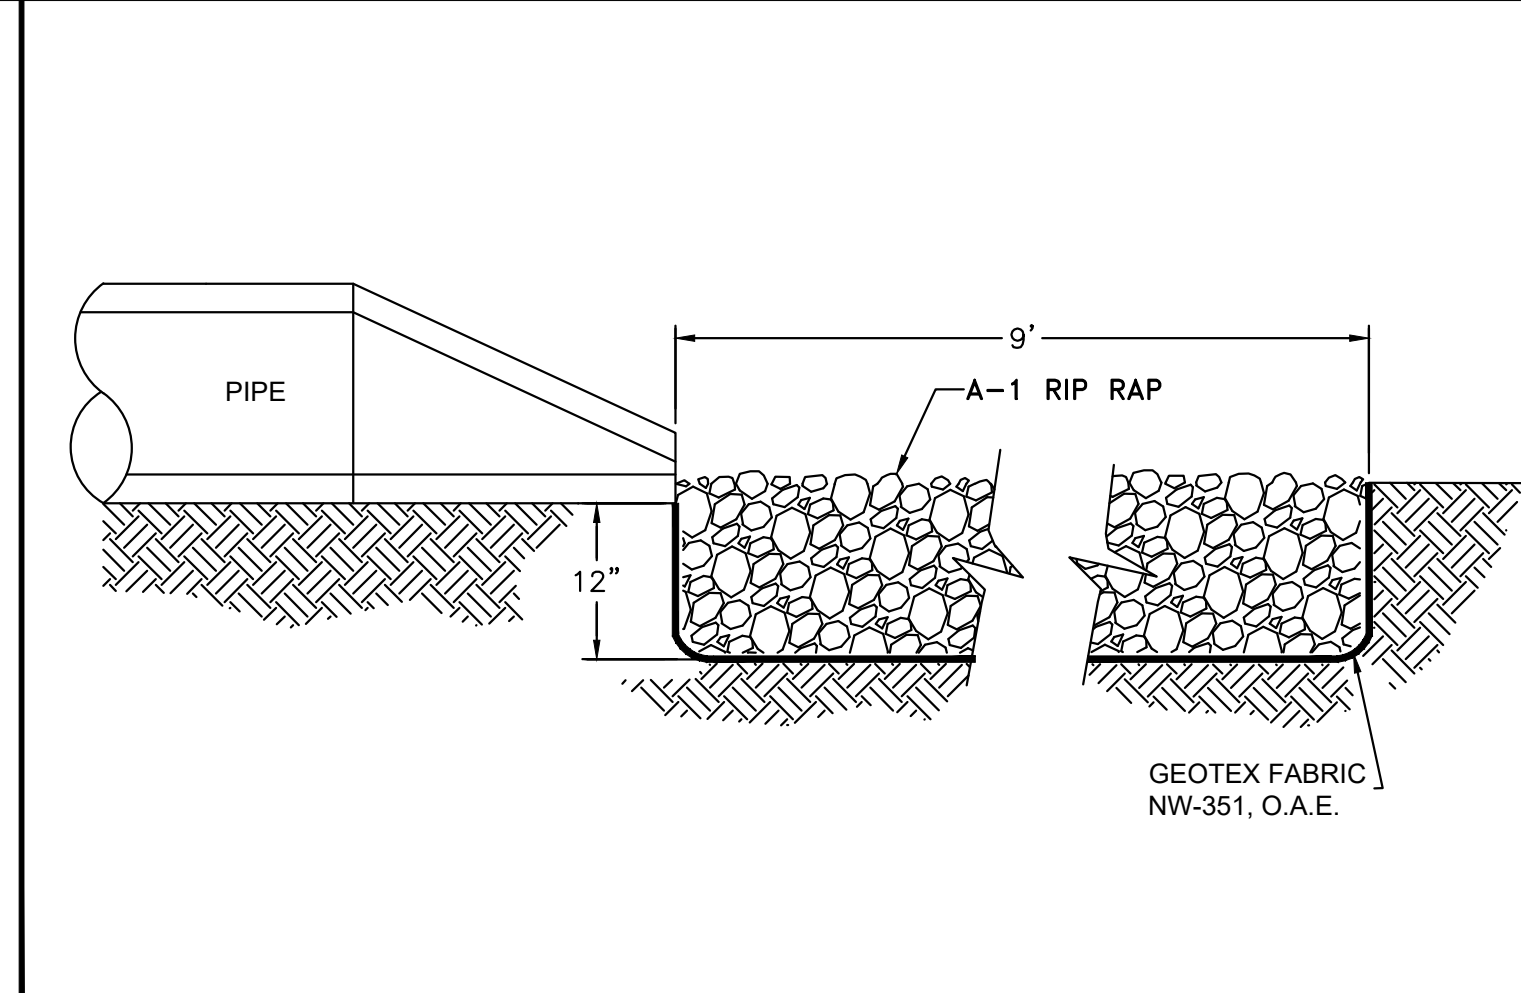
DETAIL OUTLET CONTROL STRUCTURE #1 SCALE: N.T.S. ③
